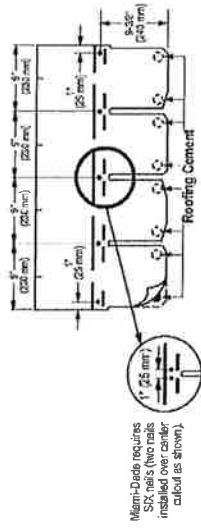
Use FIVE nails and eight spots of asphalt roofing cement under each tab corner.
